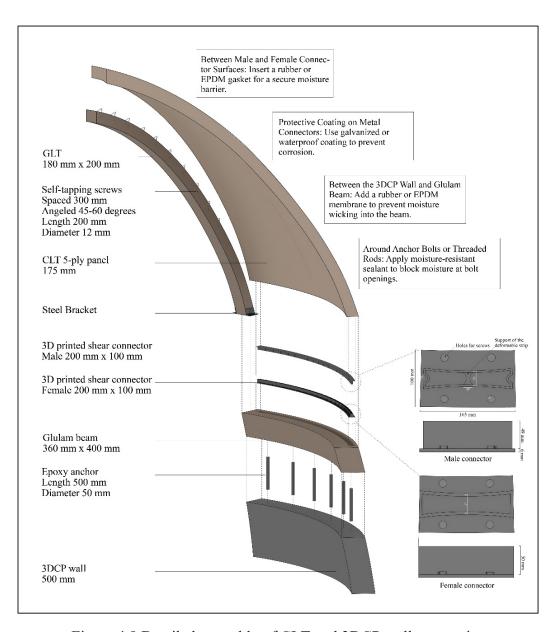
Detailed assembly of CLT and 3DCP wall connection
